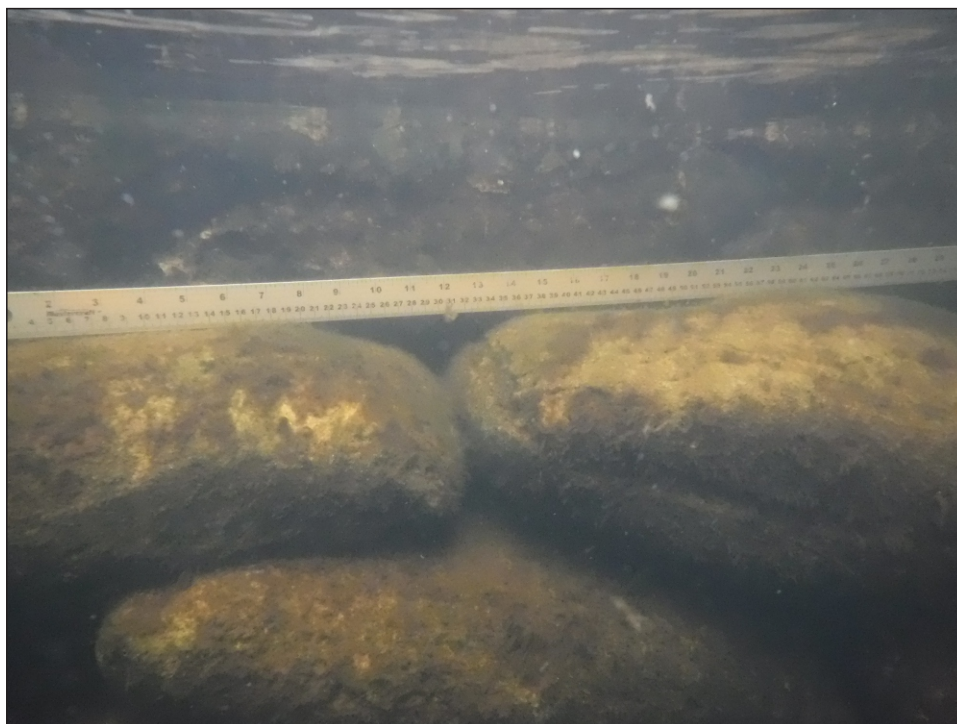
Interface between grout bags and concrete cap at surface, East Pier
